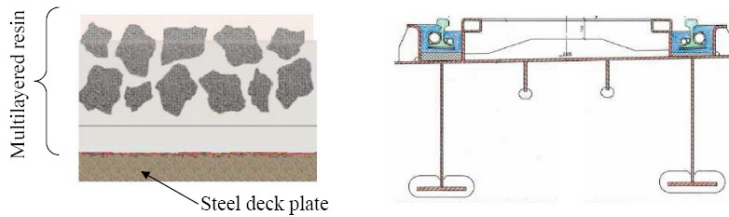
Schematic view: roadway pavement, on the left, and embedded rail system, on the right.
